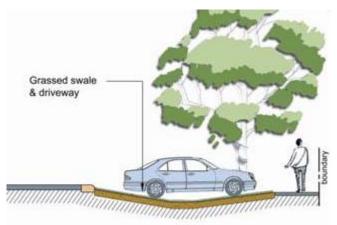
Typical Arrangement of a Swale "at-grade" Driveway Crossing
